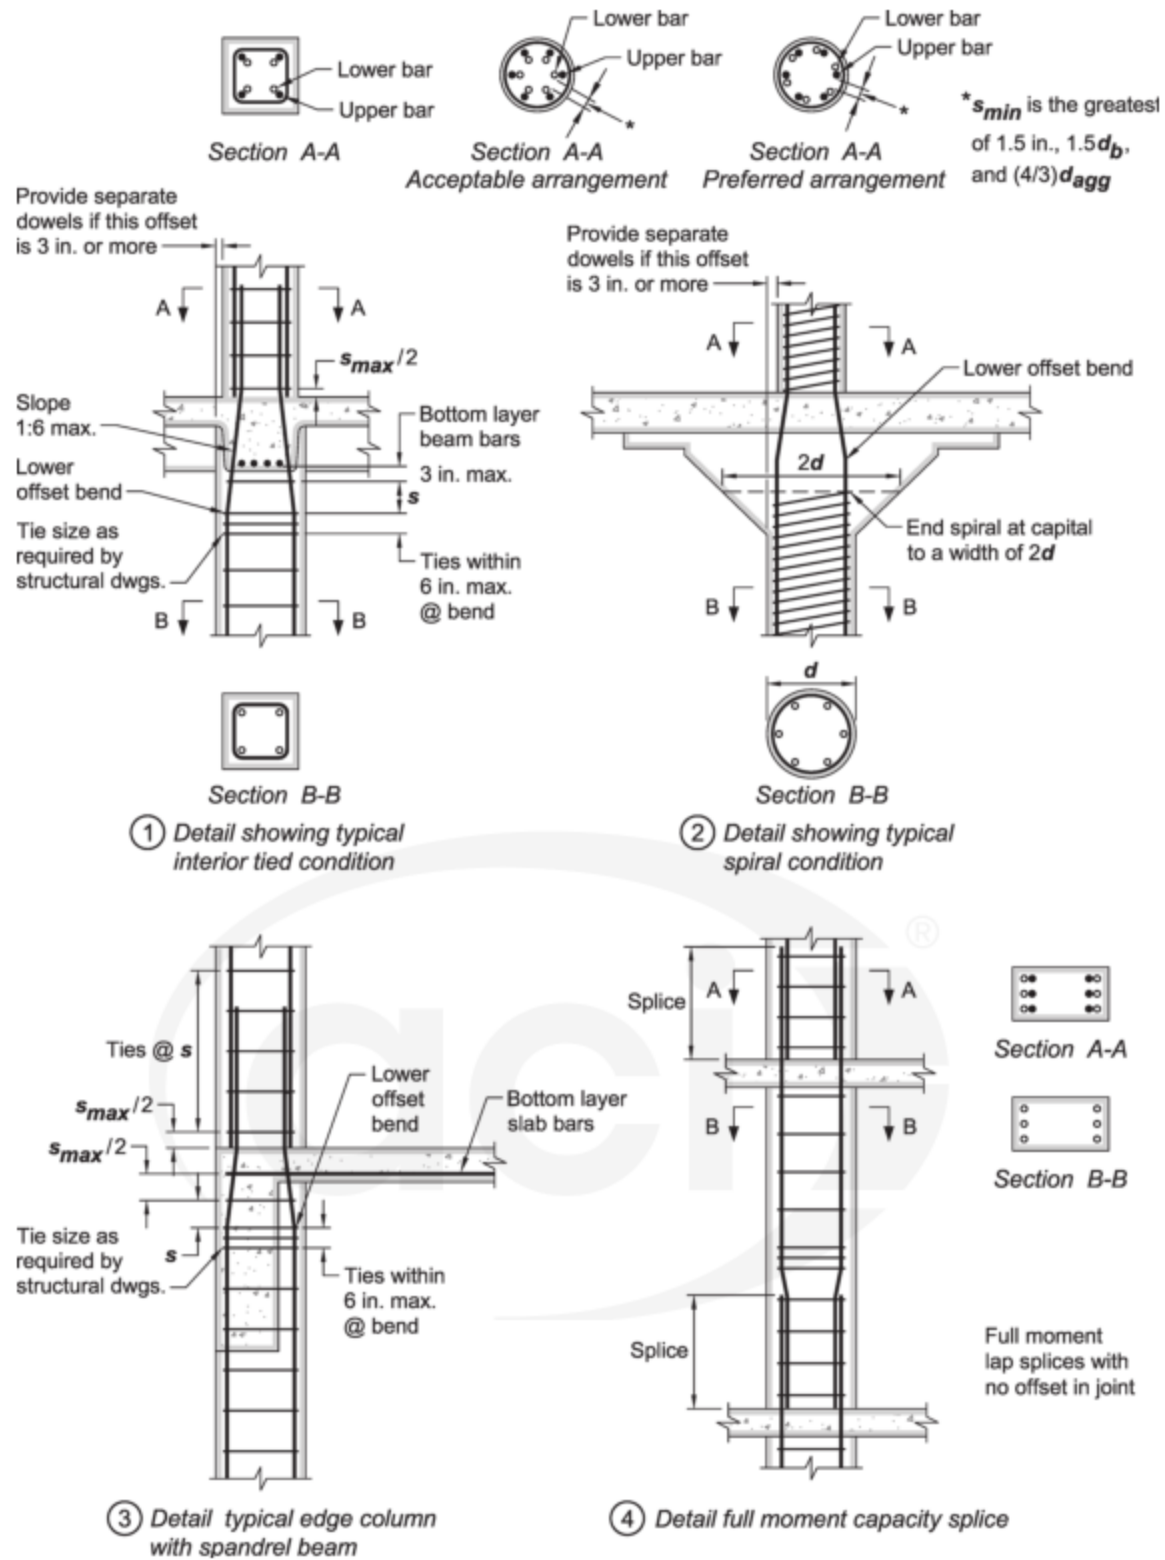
Column splice details (ACI 315-99).
